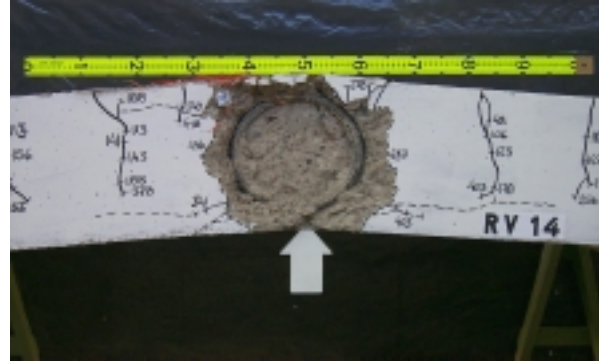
Spalling of side concrete cover in frame corner (*Type 3*) when using spliced reinforcement loops. Photos from Johansson (1996) and Grassl (1999), respectively.
